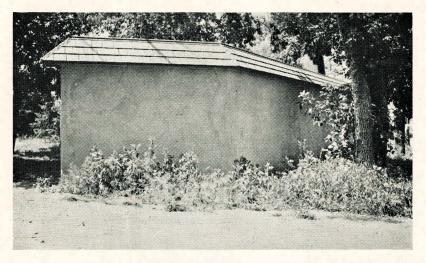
Stucco Panels on a Section of Rammed Earth Wall.
